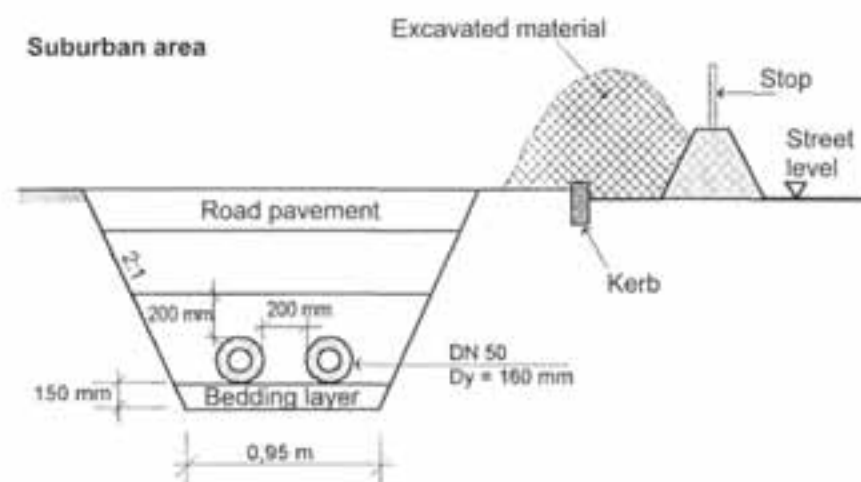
Example of pipe trench section in suburban area, dimension DN 50
